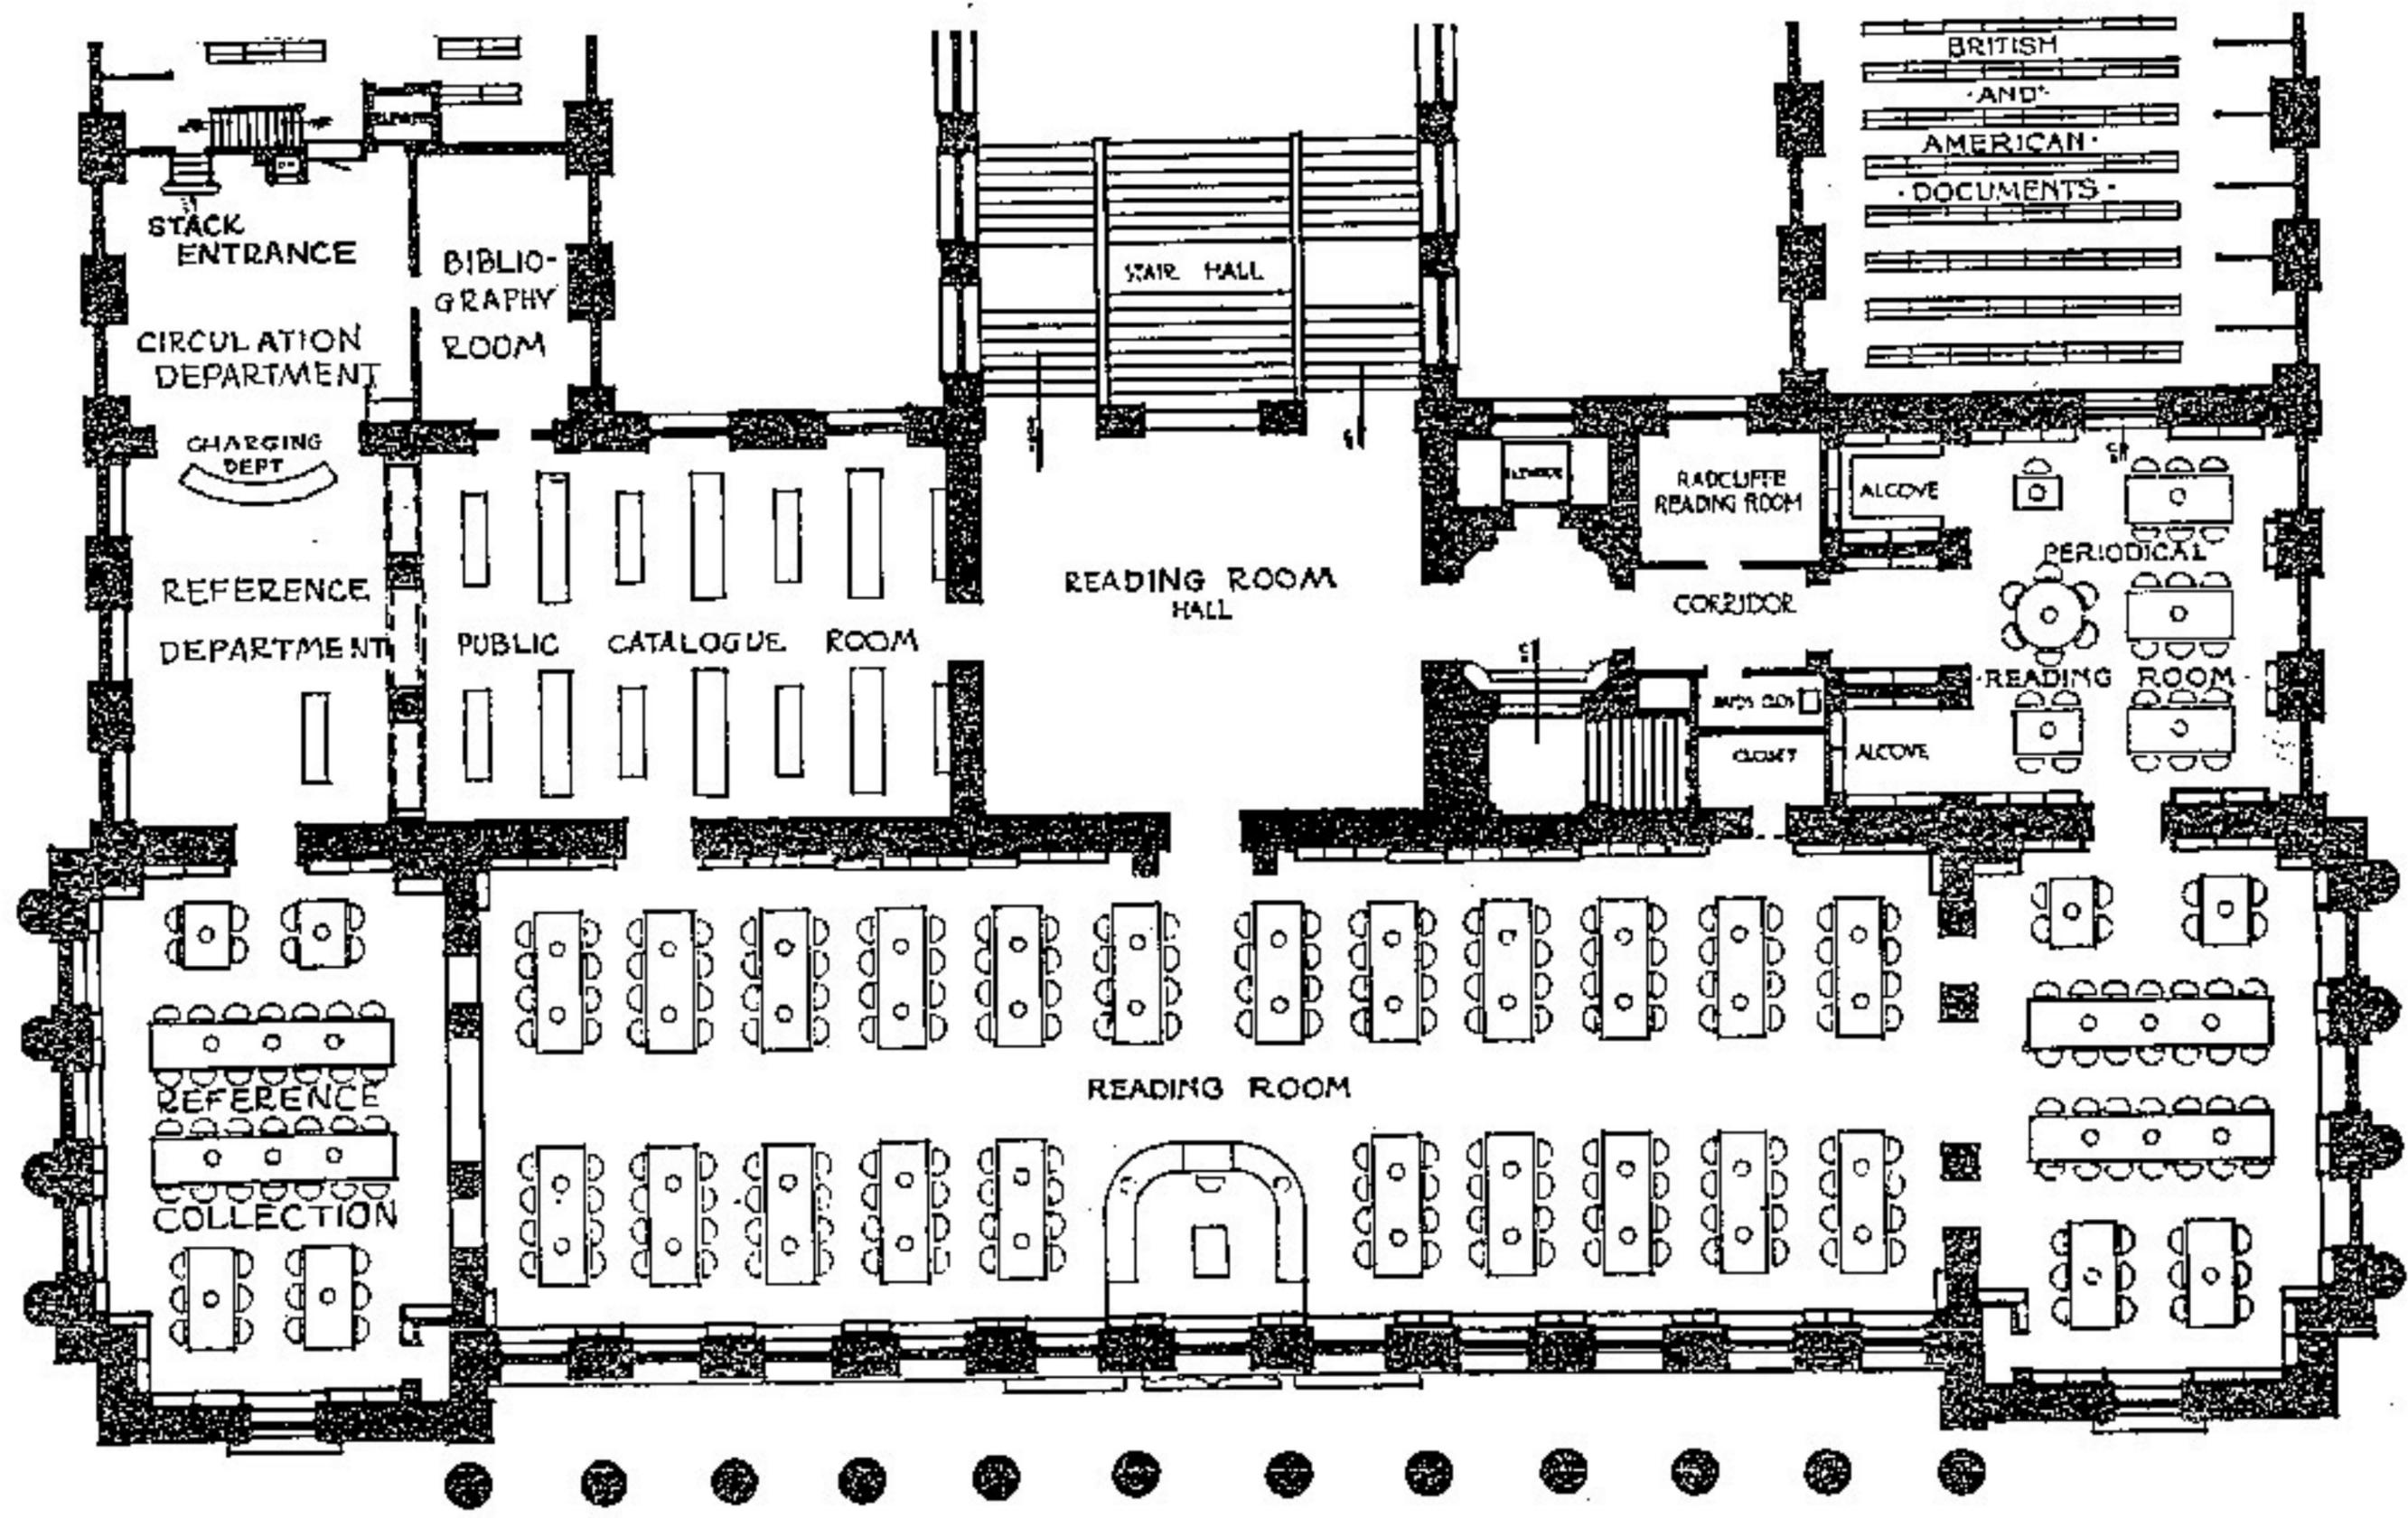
THE WIDENER BUILDING, SECOND FLOOR
